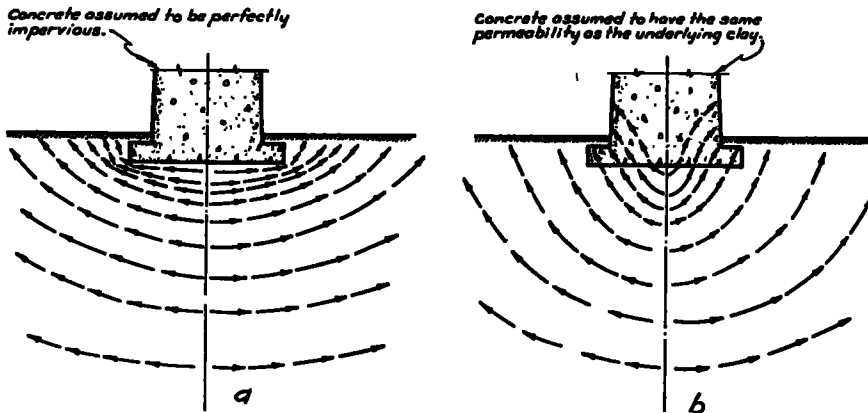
Direction of Flow of Surplus Water Expelled from the Voids of a Deep Clay Layer Compressed beneath a Massive Concrete Pier
